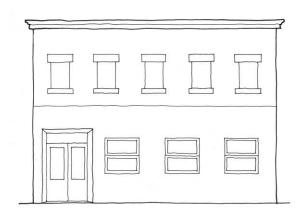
The windows on the ground floor are too small. The shape and style of these windows are not in keeping with the building style.
